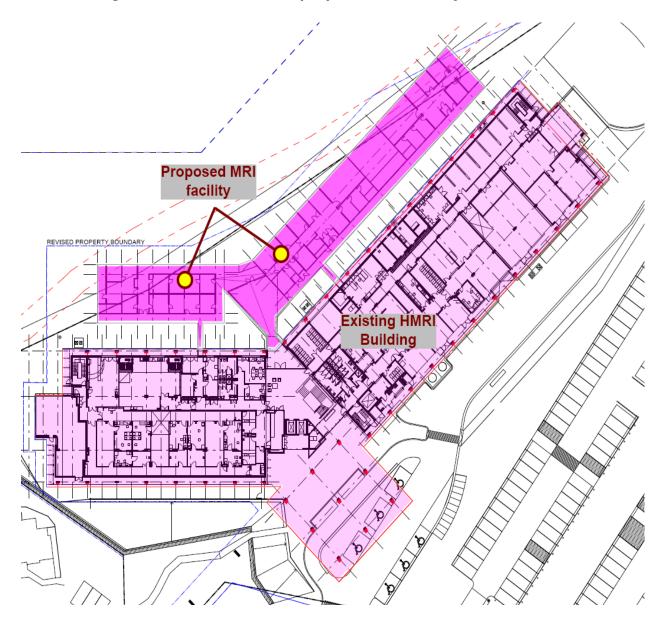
Site Plan of existing Hunter Medical Research Institute building and the location of the proposed MRI facility.
